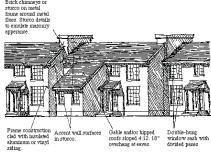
Plan and elevation views illustrating design criteria for multi-family units.
